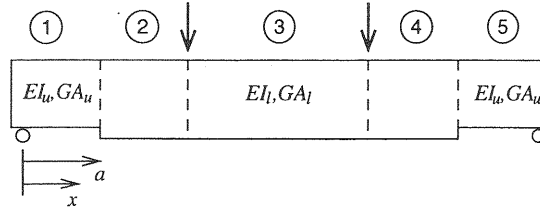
Idealization of laboratory specimen into discrete cross sections
